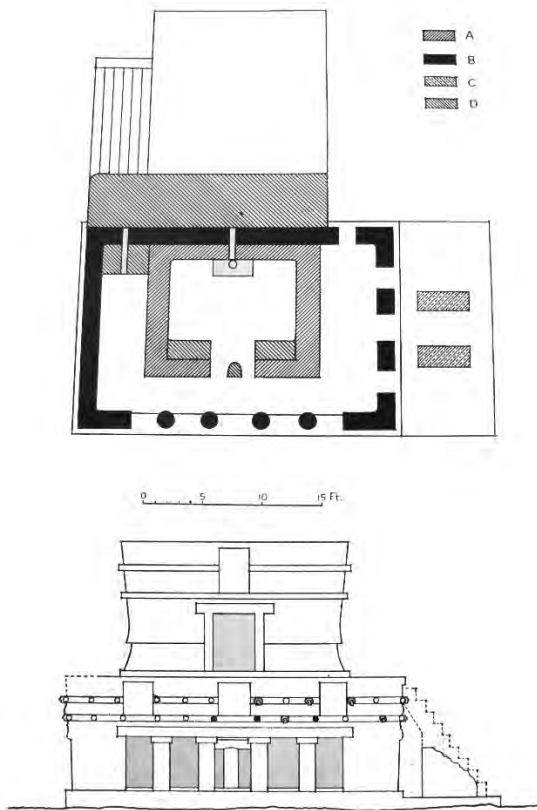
Ground-plan and elevation, Temple of the Frescoes, Tulum.
